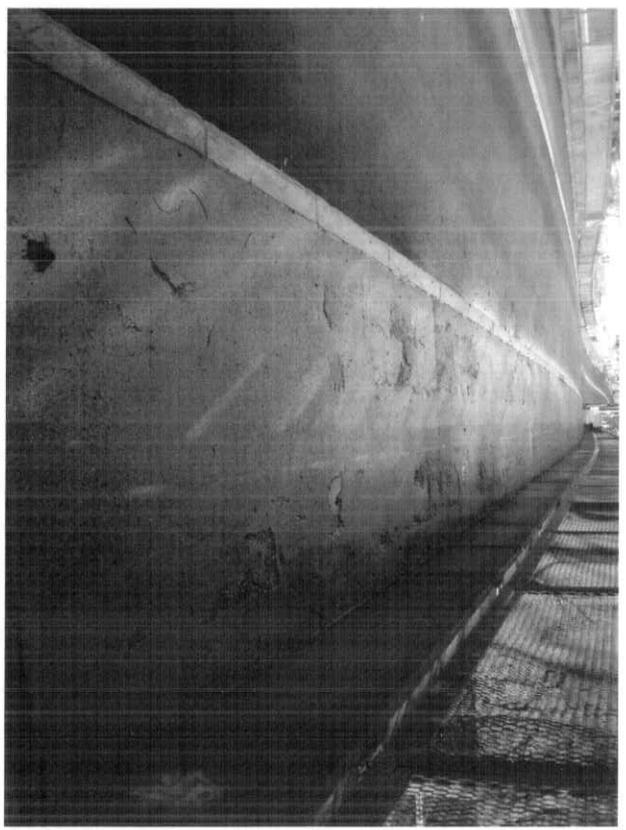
GENERAL VIEW OF CONCRETE HEADER AT ABUTMENT # 1.
